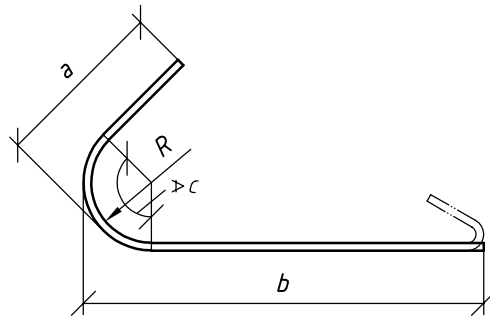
Bending dimensions — Shape code 99 (non-standard example)
